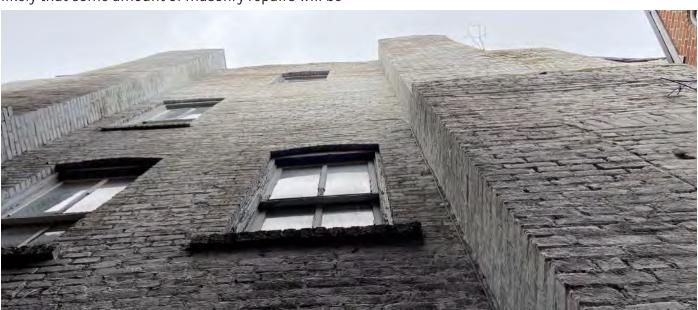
E-5: Chimney #1 and Chimney #2 deformation at east elevation.
